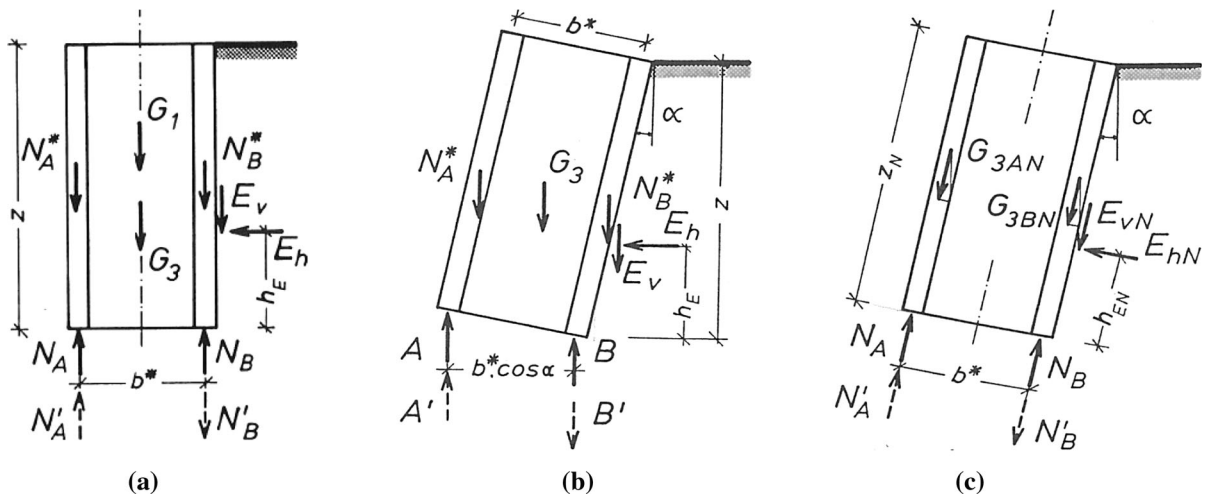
Illustration of the forces acting on vertical and inclined crib walls made from precast concrete elements (Brandl 1980)
